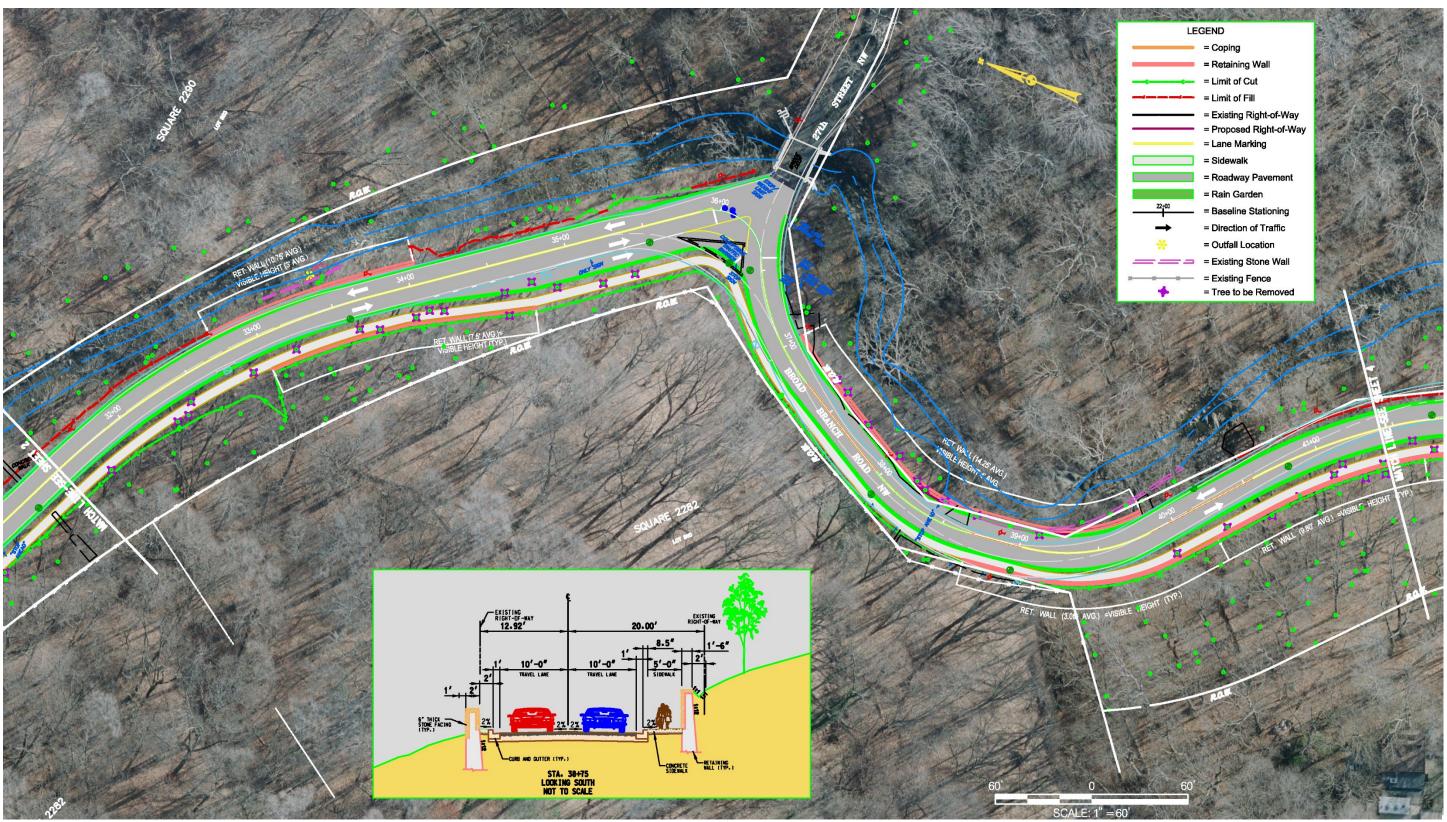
Alternative 3 Modified (Sheet 3 of 9)
